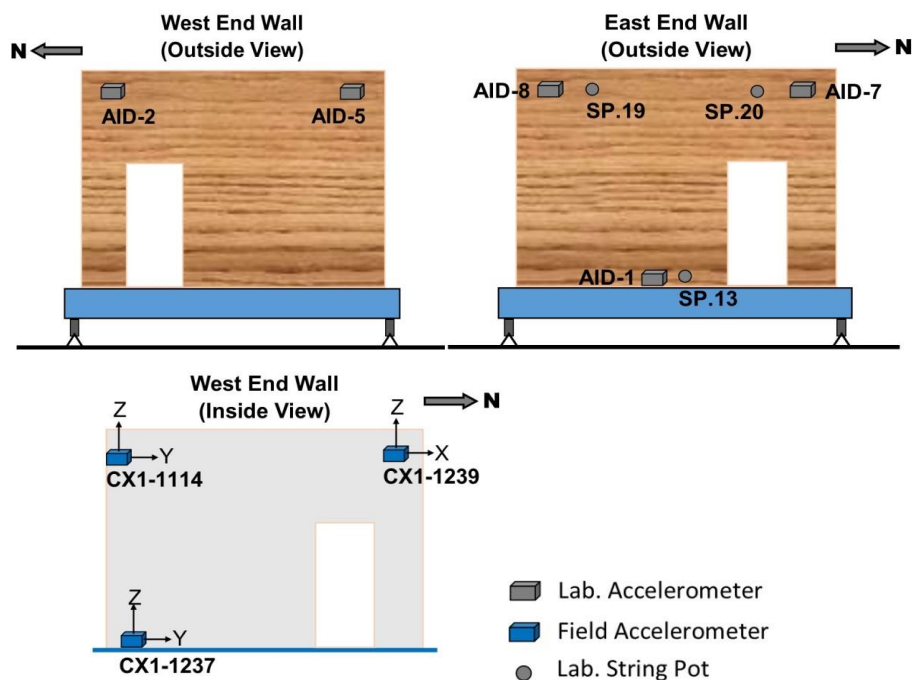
Instrumentation layout on the end walls of the specimen [1]
